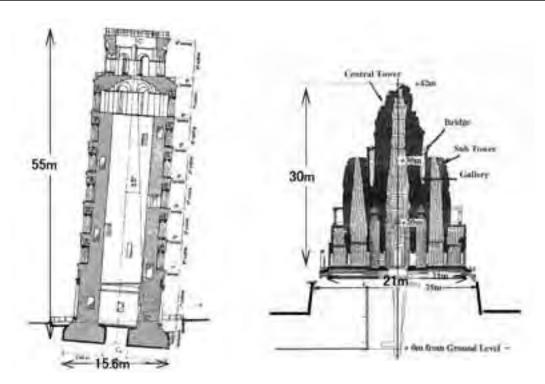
Leaning Tower Pisa and Central Tower at Bayon.
